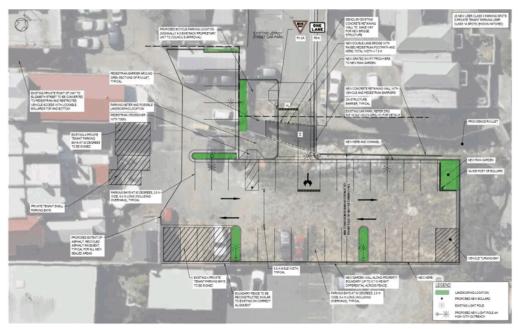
Preliminary site plan - 321-323A and 325 Elizabeth Street car park (Source: pitt&sherry preliminary drawing S-P.19.0421--00-CIV-DRG-121)
